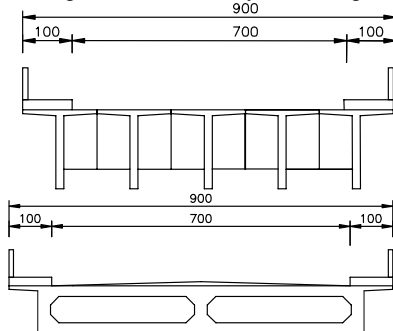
(b) Bridge superstructure sections. (simply supported T beam and prestressed continuous box girder)
